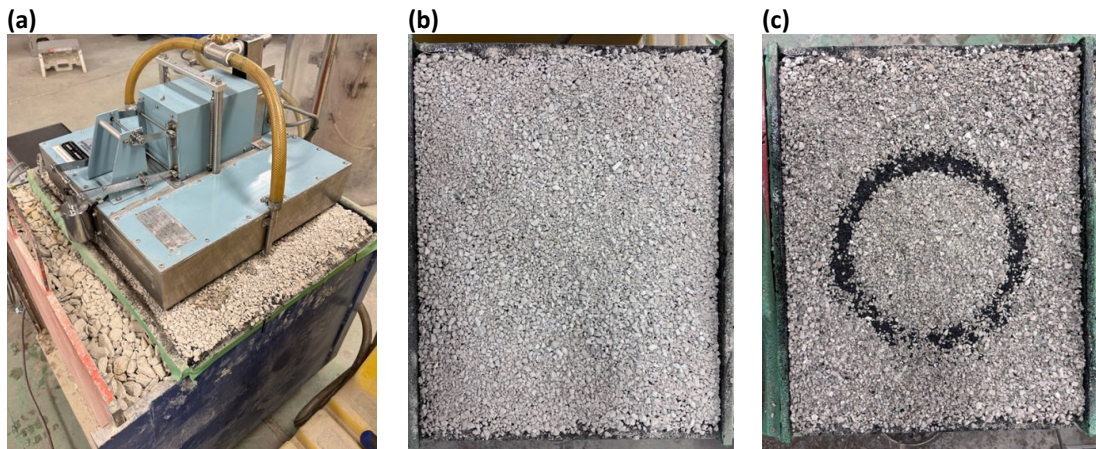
Photos. (a) DFT testing of Otta seal applied over the box setup, (b) specimen photo before testing, and (c) specimen photo after DFT testing.
